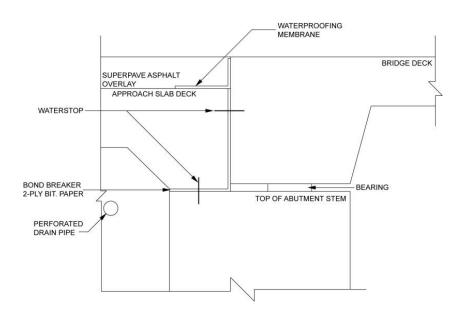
Waterproofing details similar to Boydstown Bridge
